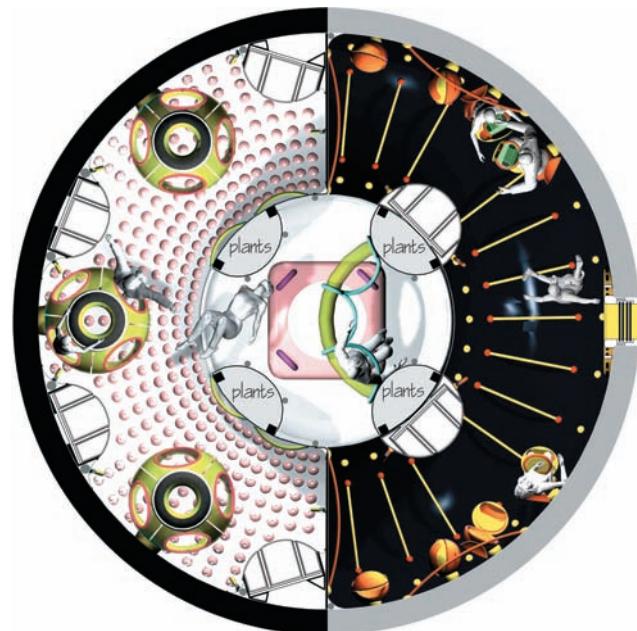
Hotel vertical section through common and private rooms: clockwise from top right—large private room, bathroom, bar-fun zone, hotel entrance, restaurant, and gymnasium; central core, starting from top—Mars room, Moon room, and central hall.
